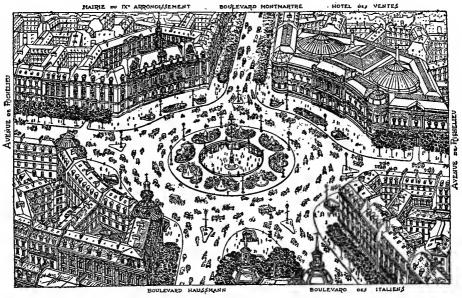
Plan showing underground street crossing for pedestrians at a center of congested traffic
